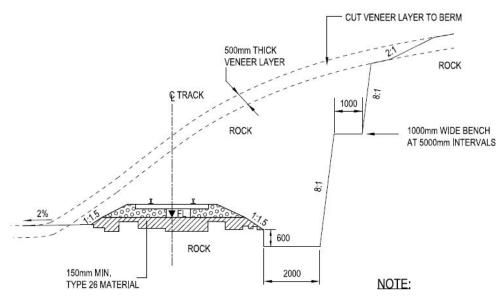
shows the typical Cross Section I of the railway embankment. Embankment Section I can be utilized where the railway is re-routed through the Precambrian terrain in order to found the embankments on rock. This is expected to be feasible between approximately Cha 0+000 and 10+000, 82+000 and 85+000 and 95+000 and 105+000. Section I consists of:
